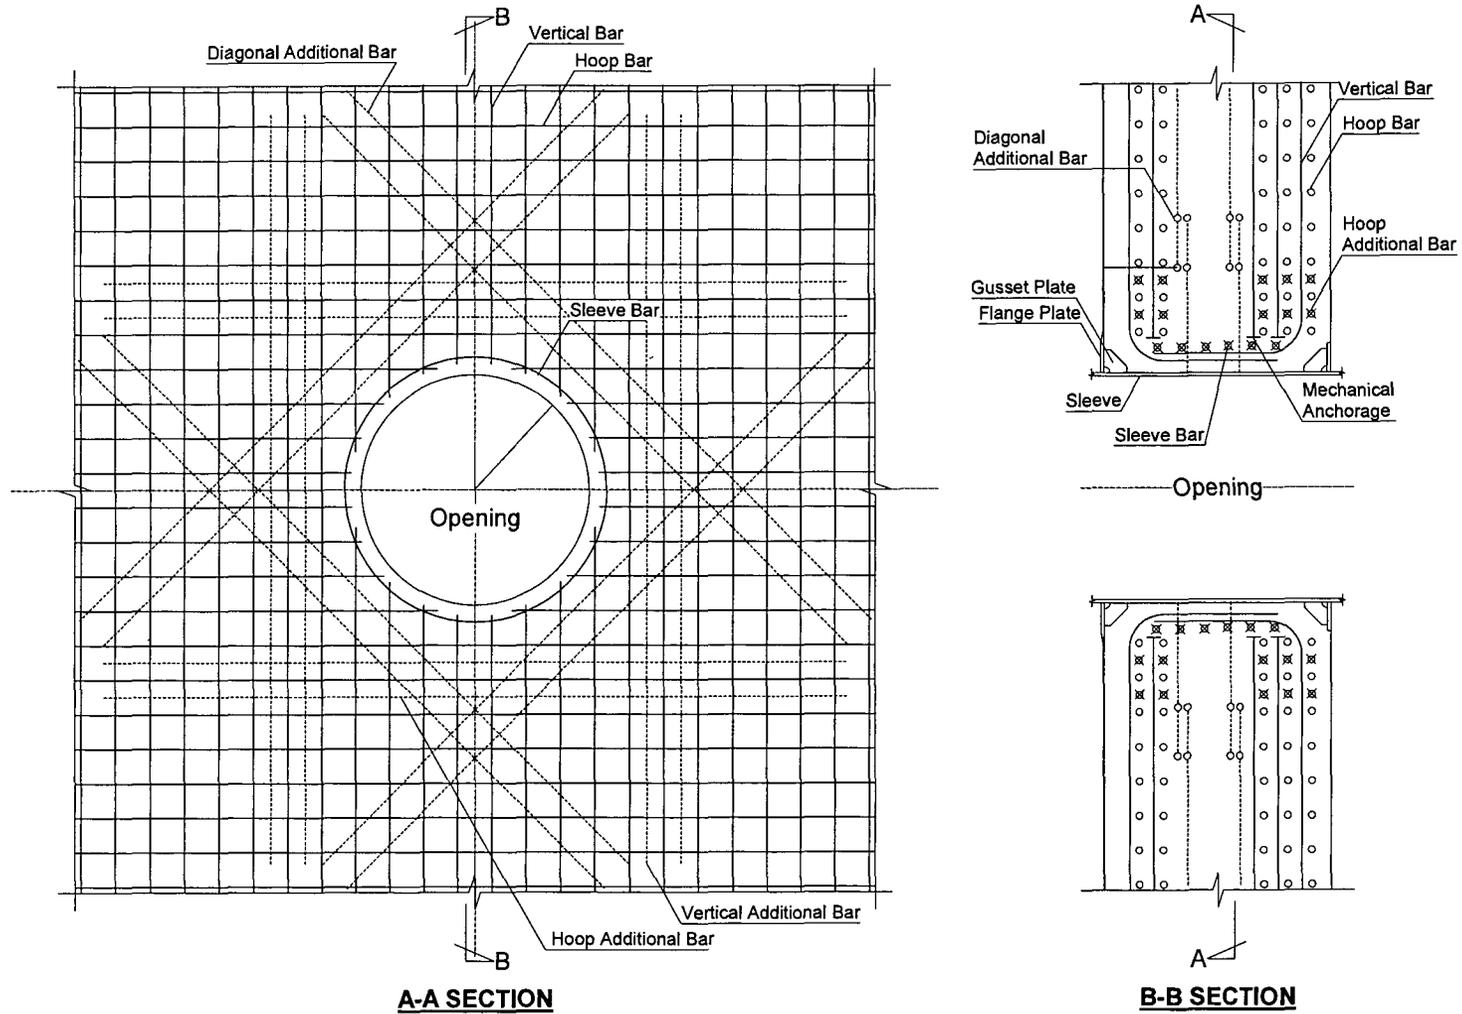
Schematic of Reinforcements in RCCV Wall Around Equipment Hatch/Personnel Airlock Opening
